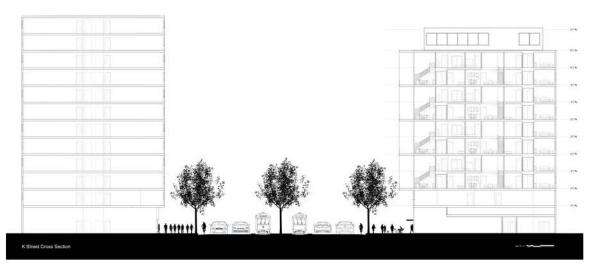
Proposed Demolition and New Construction of 1606 K Street N.W.
